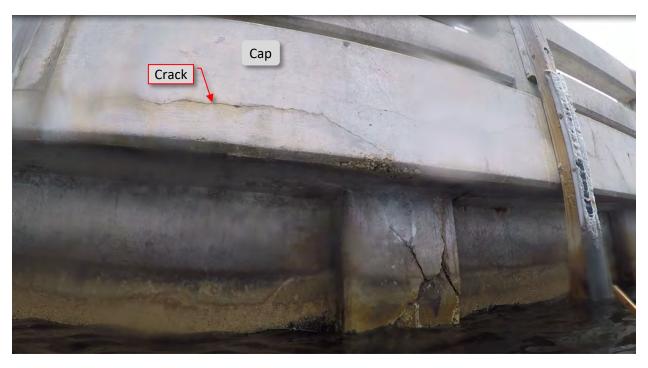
C10. STA 5+93 - 6+00. Crack at vertical face of cap.
